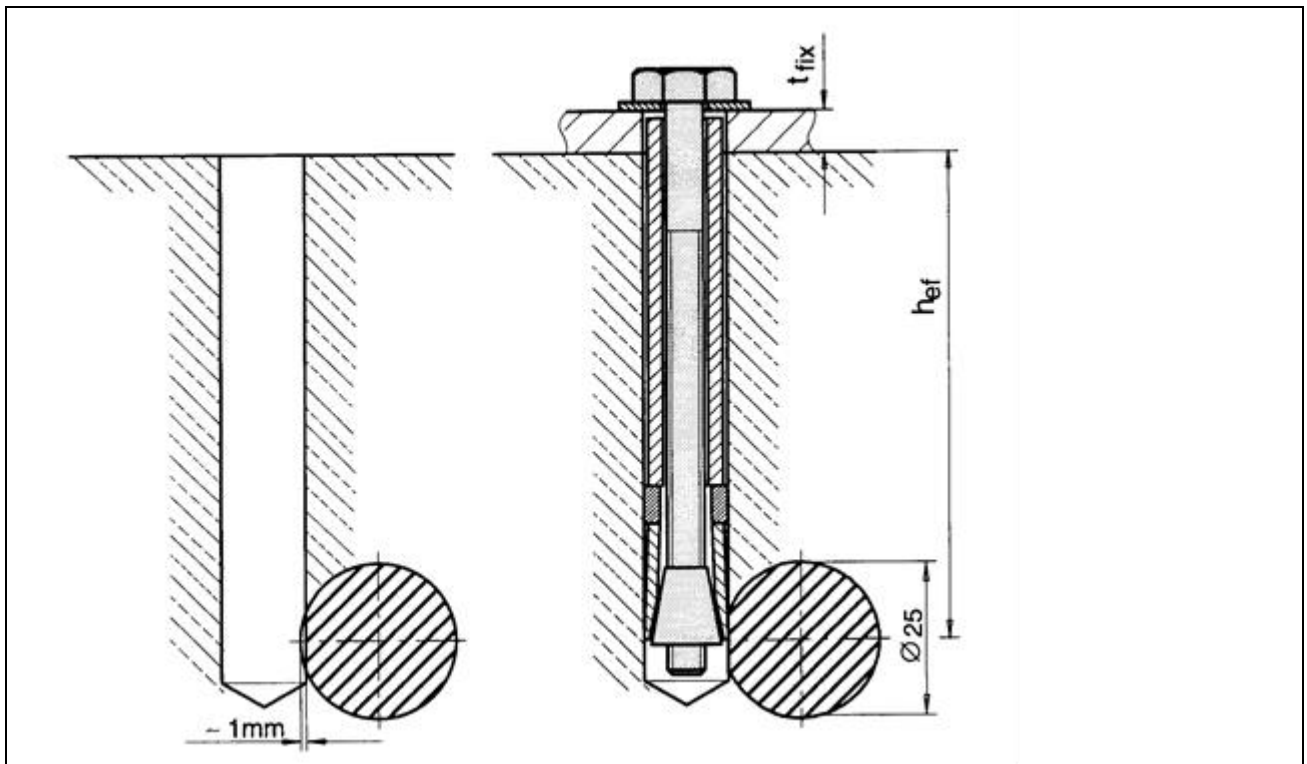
Position of fastener when tested in contact with reinforcement
